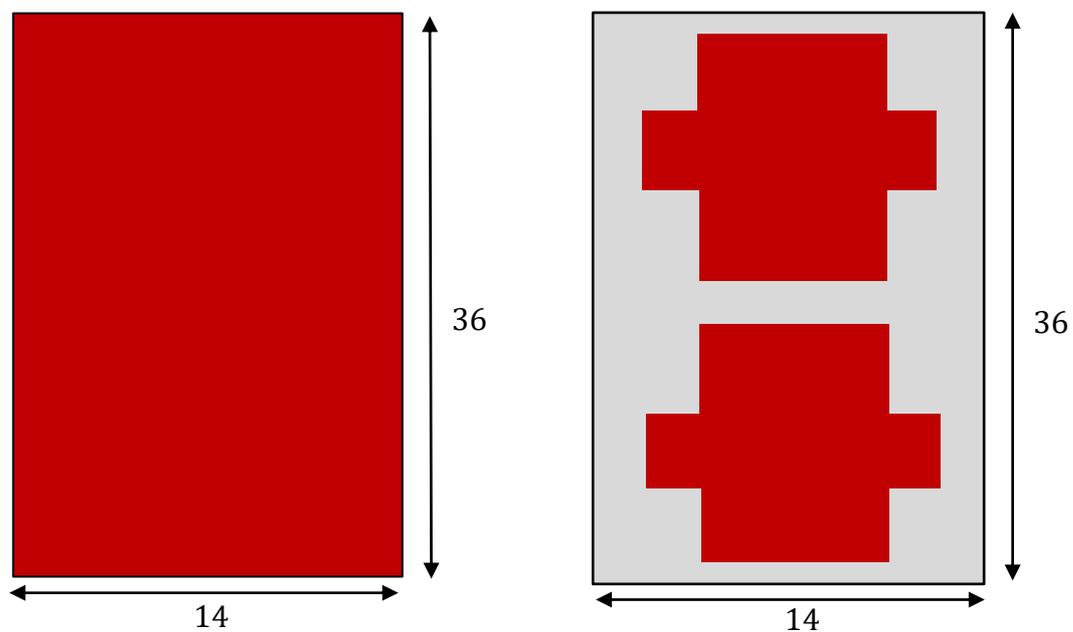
Dimensions of solid floor and openings in the reference building.
